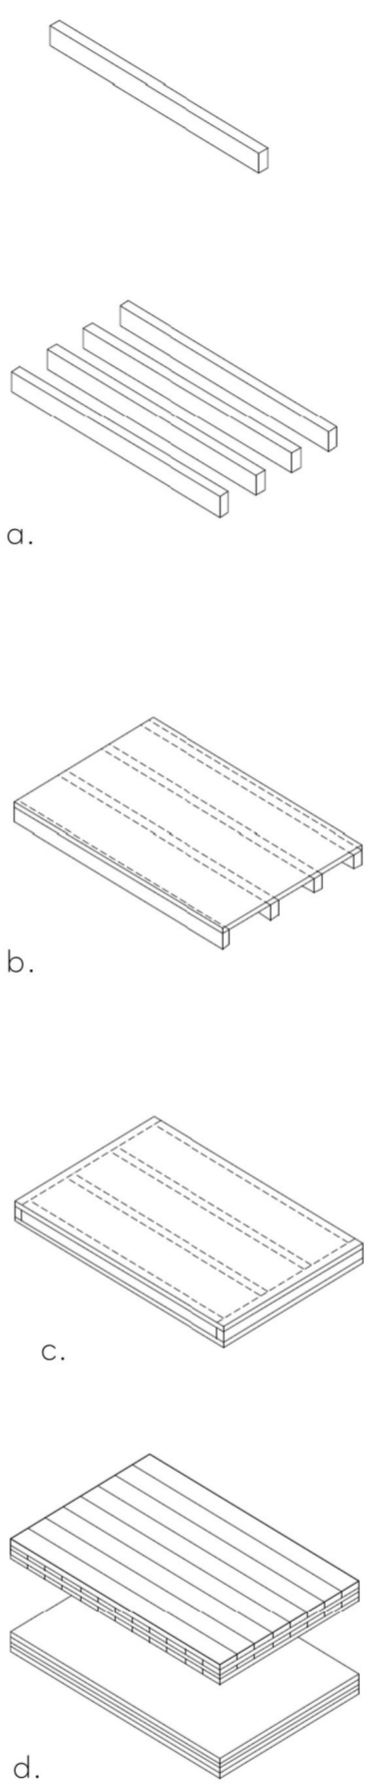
Examples of horizontal structural components. a. Beams made of Glulam and LVL, b. Ribbed box opened slabs, c. Ribbed closed slabs, d. CLT and DLT slabs
